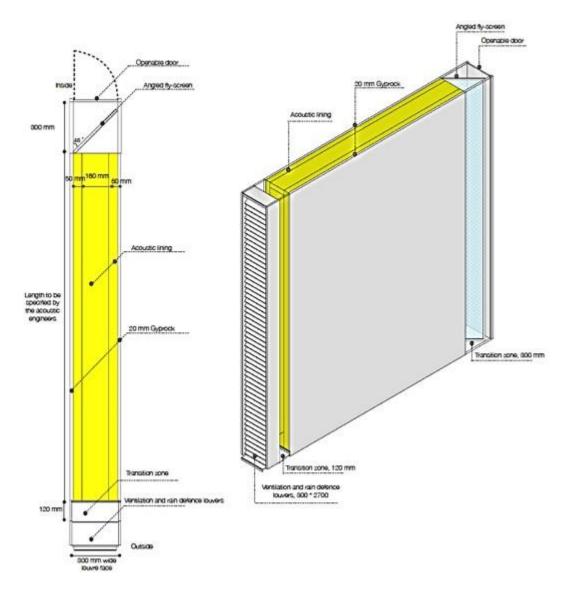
Typical detail of proposed attenuated natural ventilation plenum (source Natural Ventilation 330-332 Botany Road, Rev. C, 1 December 2022, Flux).
